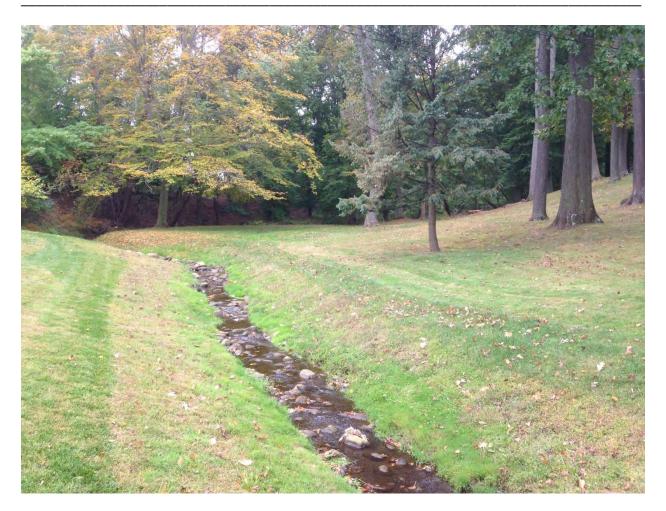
West Waverly Road Detention Basin locale. View to southwest.
